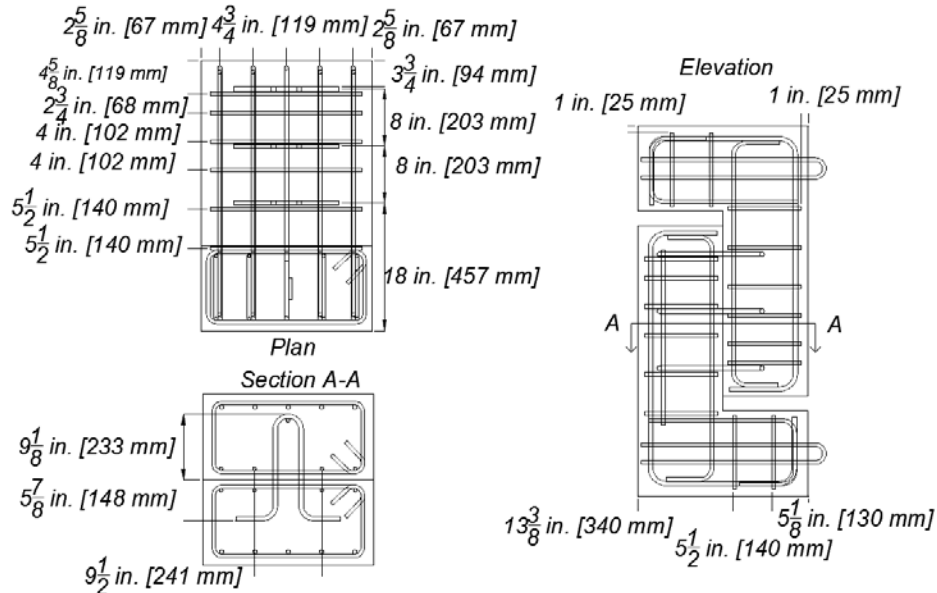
Reinforcing layout for specimens containing #5 (#16M) reinforcing bars
